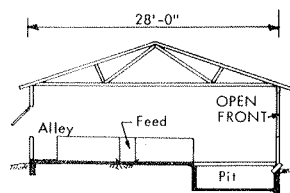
End cut of Midwest Plan Service plan No. 72673R1.
